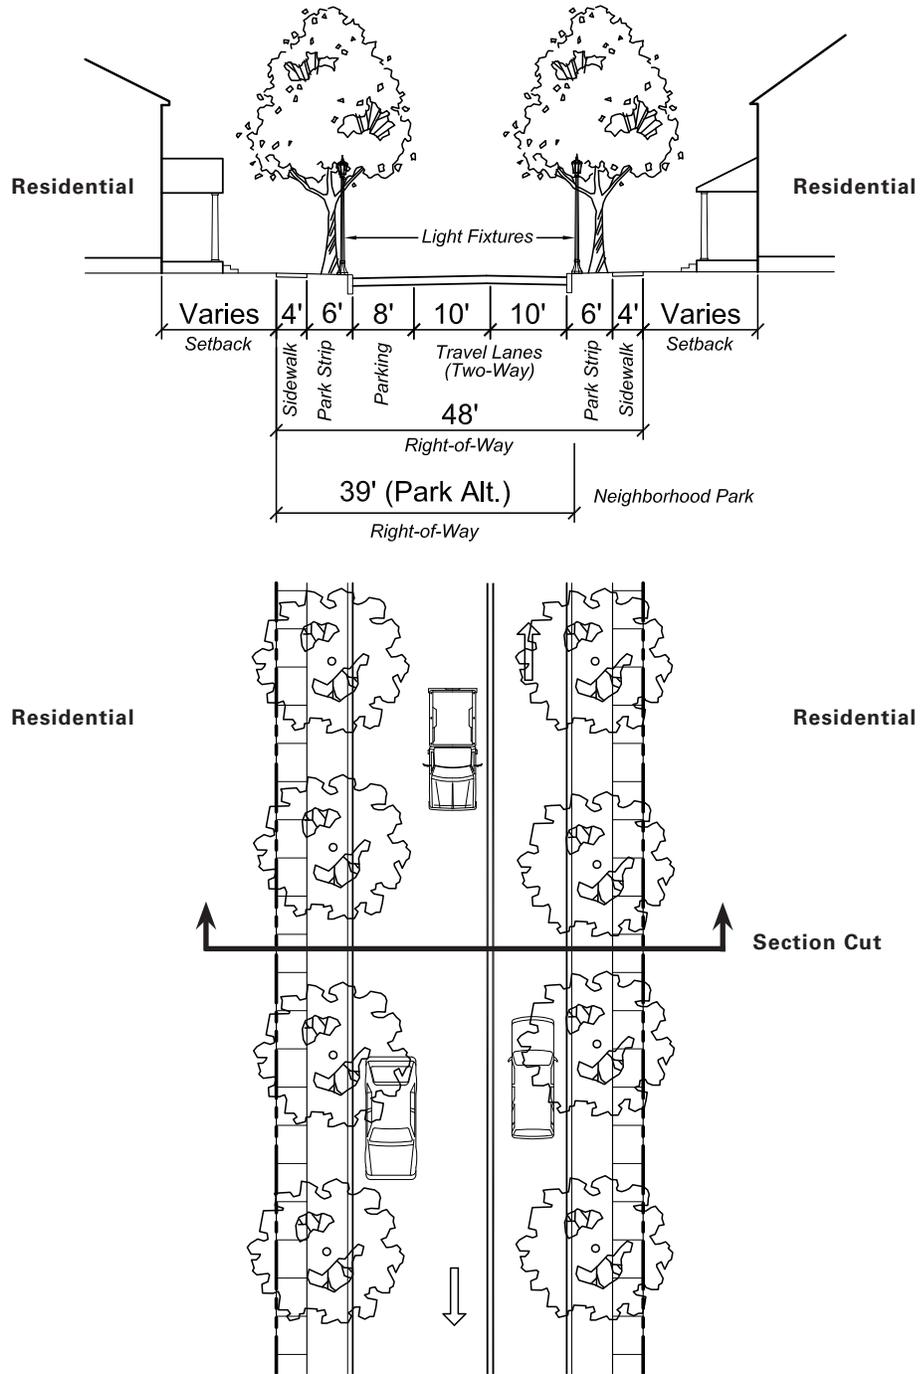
Proposed Section and Plan: Neighborhood Street B
